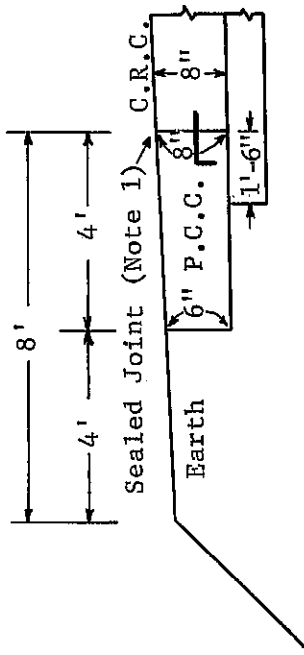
Layout of I-74 portland cement concrete shoulder experiment
